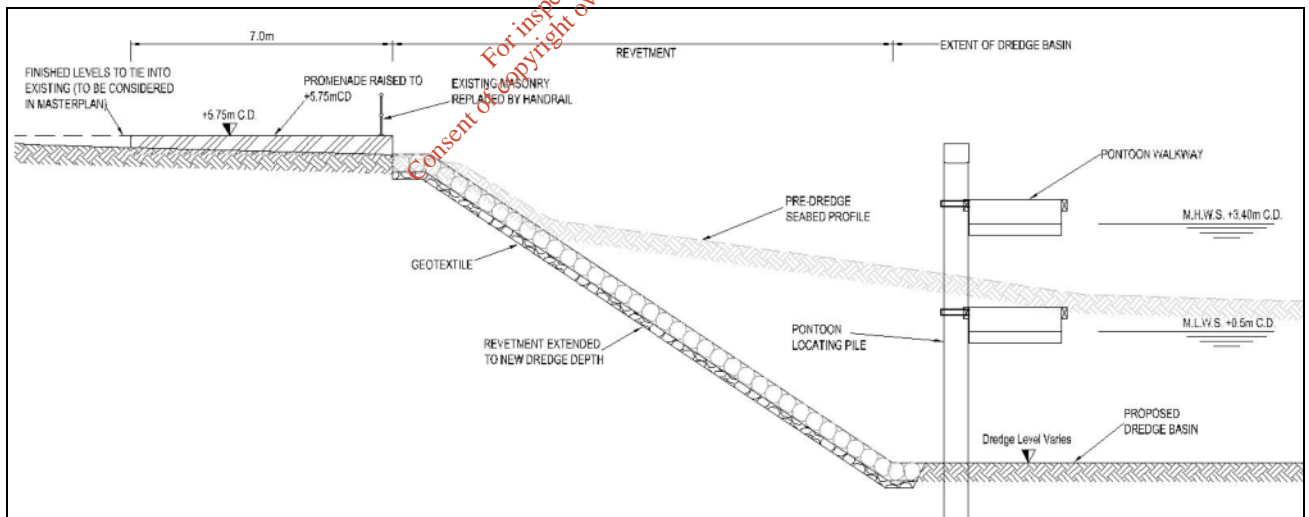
Proposed Revetment Detail at Northern Embankment
